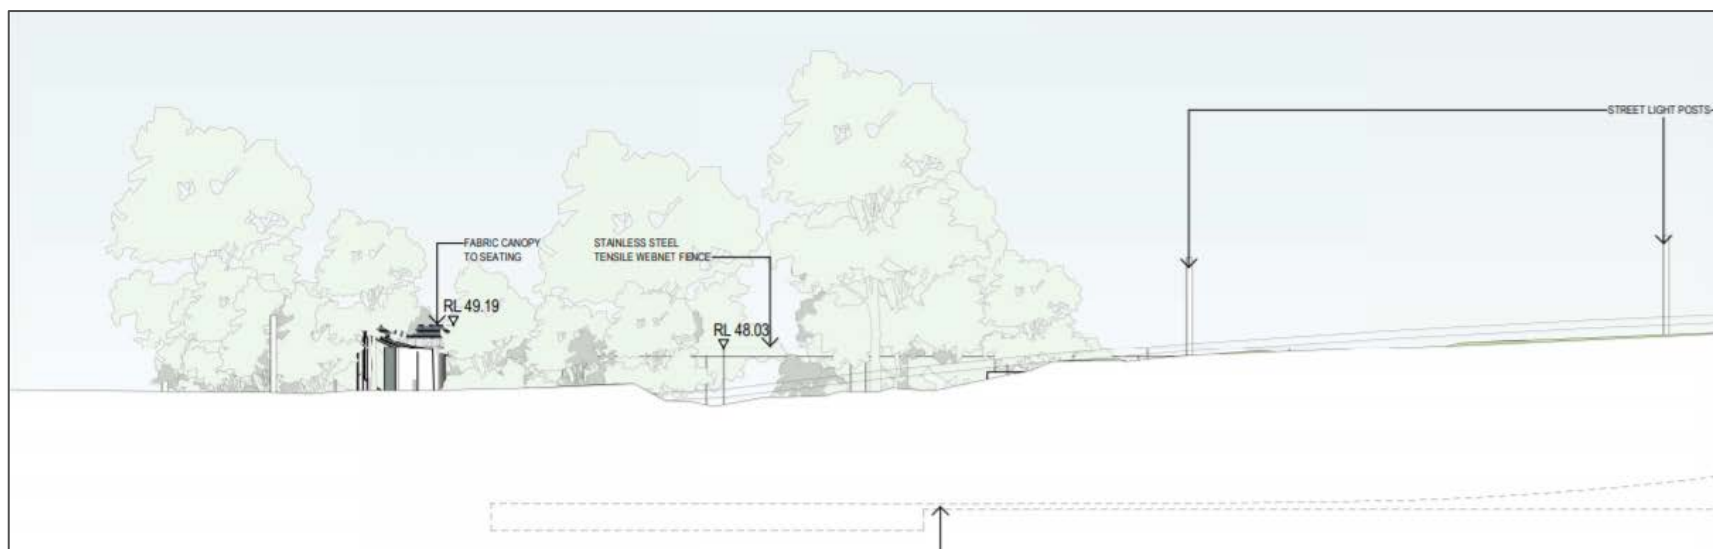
| Northern (Bayview Hill Road) elevation of the SWSLP (Source: Applicant's RtS 2021)
